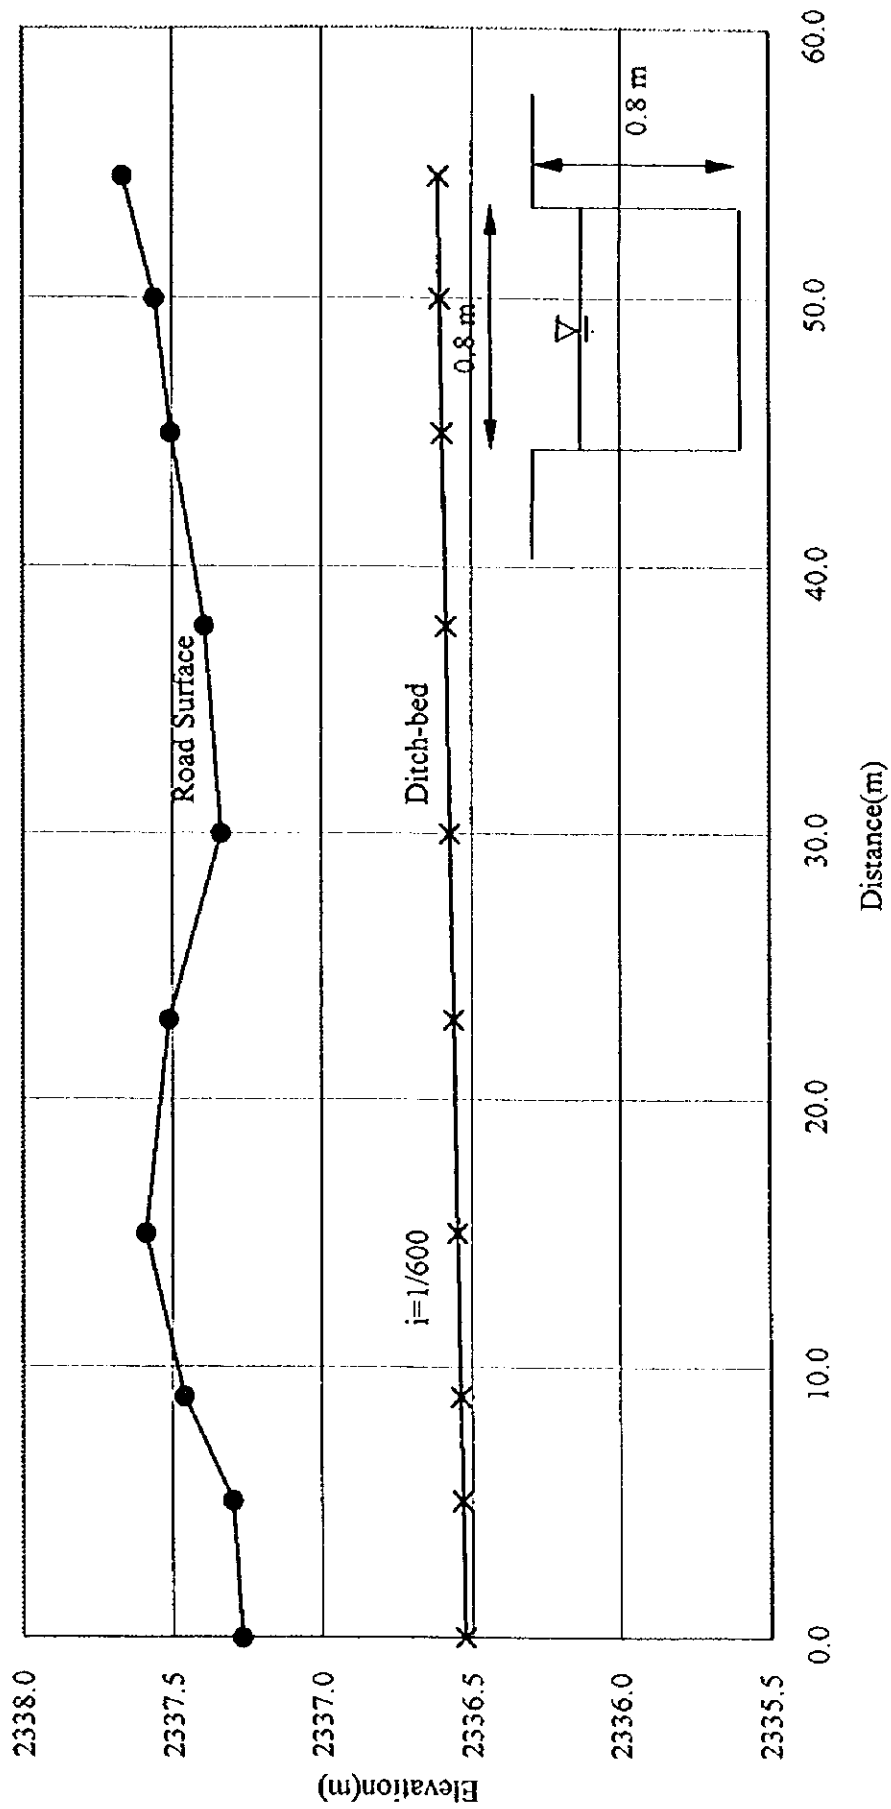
Longitudinal and Cross-sectional Profiles of Drainage Ditch across the Avenue for WS3-2 Basin
